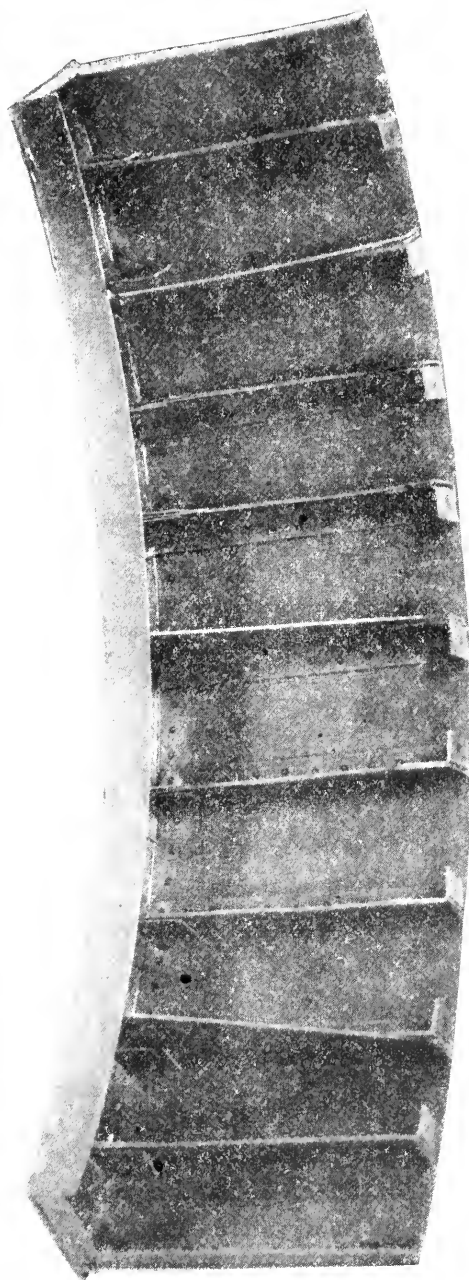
MODEL OF A STRUCTURAL STEEL
